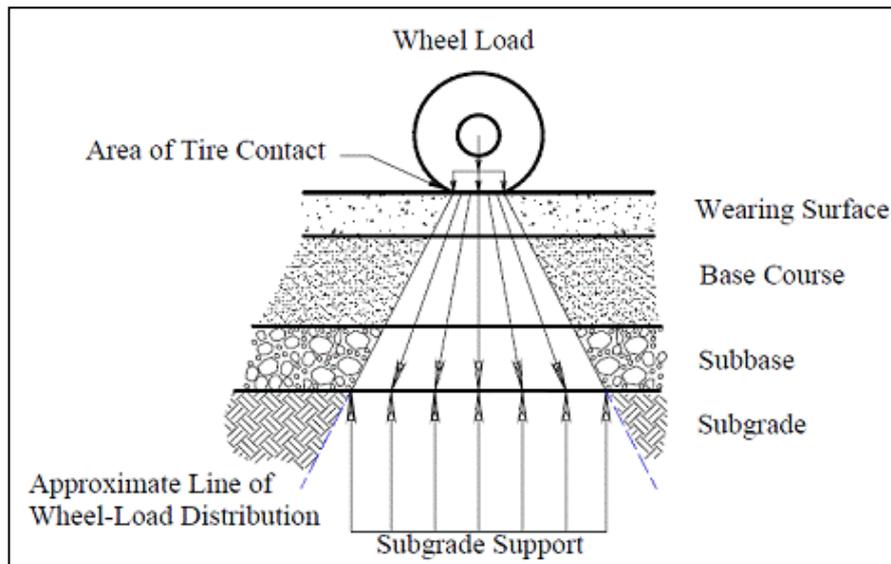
Distribution of load stress in flexible pavement (The Constructor)
